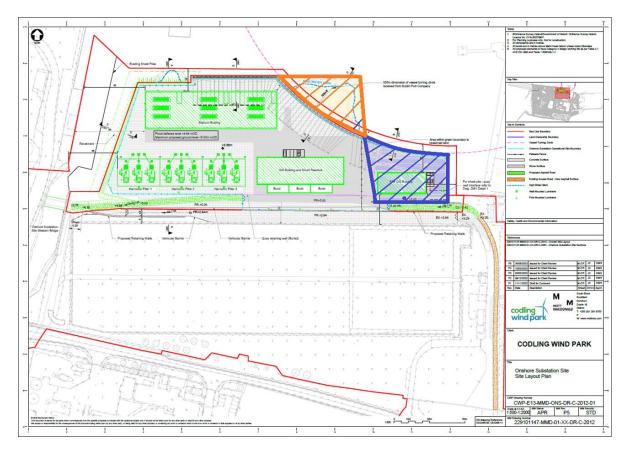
Codling Wind Park onshore sub-station site layout plan. Reclamation area hatched blue and demolition/dredge area hatched orange.
